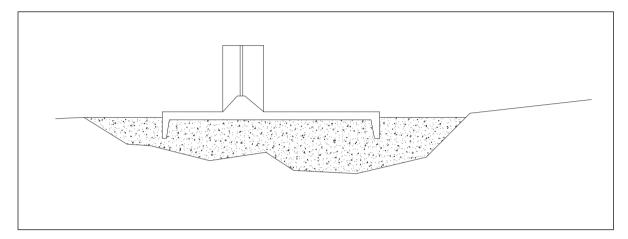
Schematic Cross Section of Dam and Mining Pit
